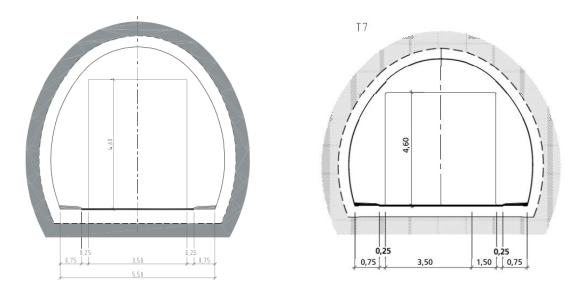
Tunnel profile T 5.5 and T 7 (Statens Vegvesen, 2006)
